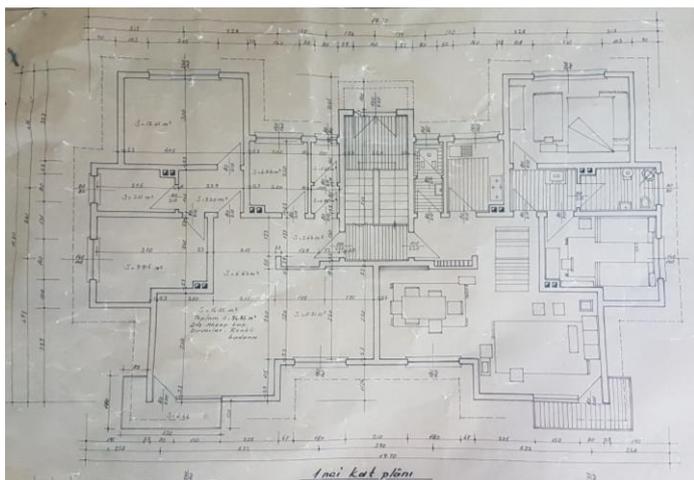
The first floor plan drawing of the four-family apartment (Source: TTK Archive, 2020)
